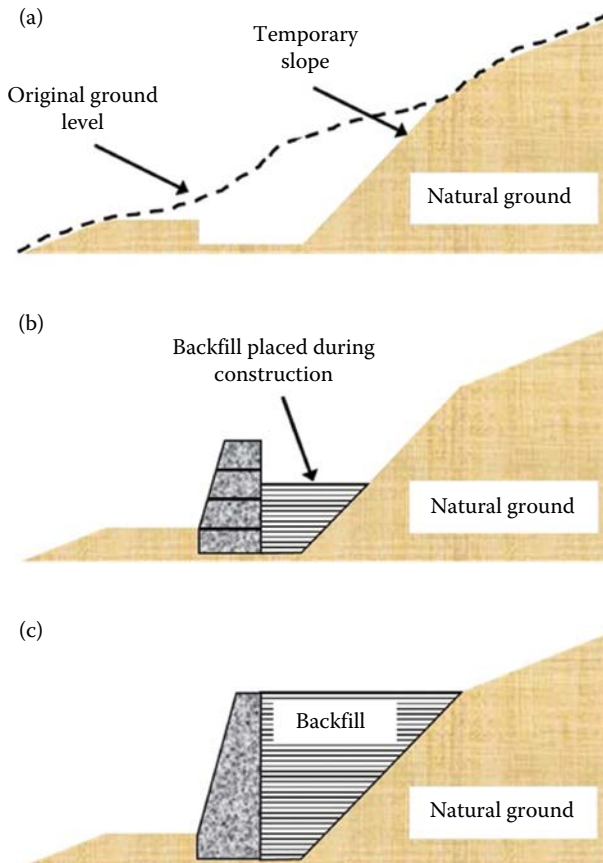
Simplified construction of a gravity wall: (a) excavation, (b) wall construction, (c) final product. (Credit: A. Braham.)
